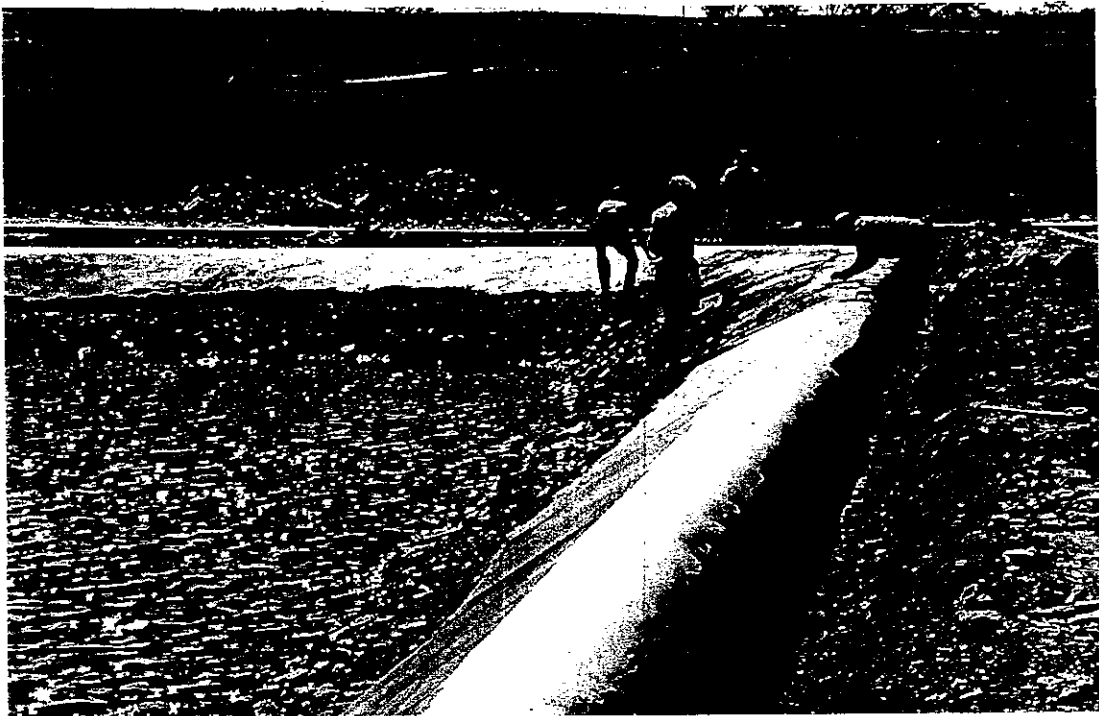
General View of Lagoon 1 showing sludge withdrawal pipework and inlet header
